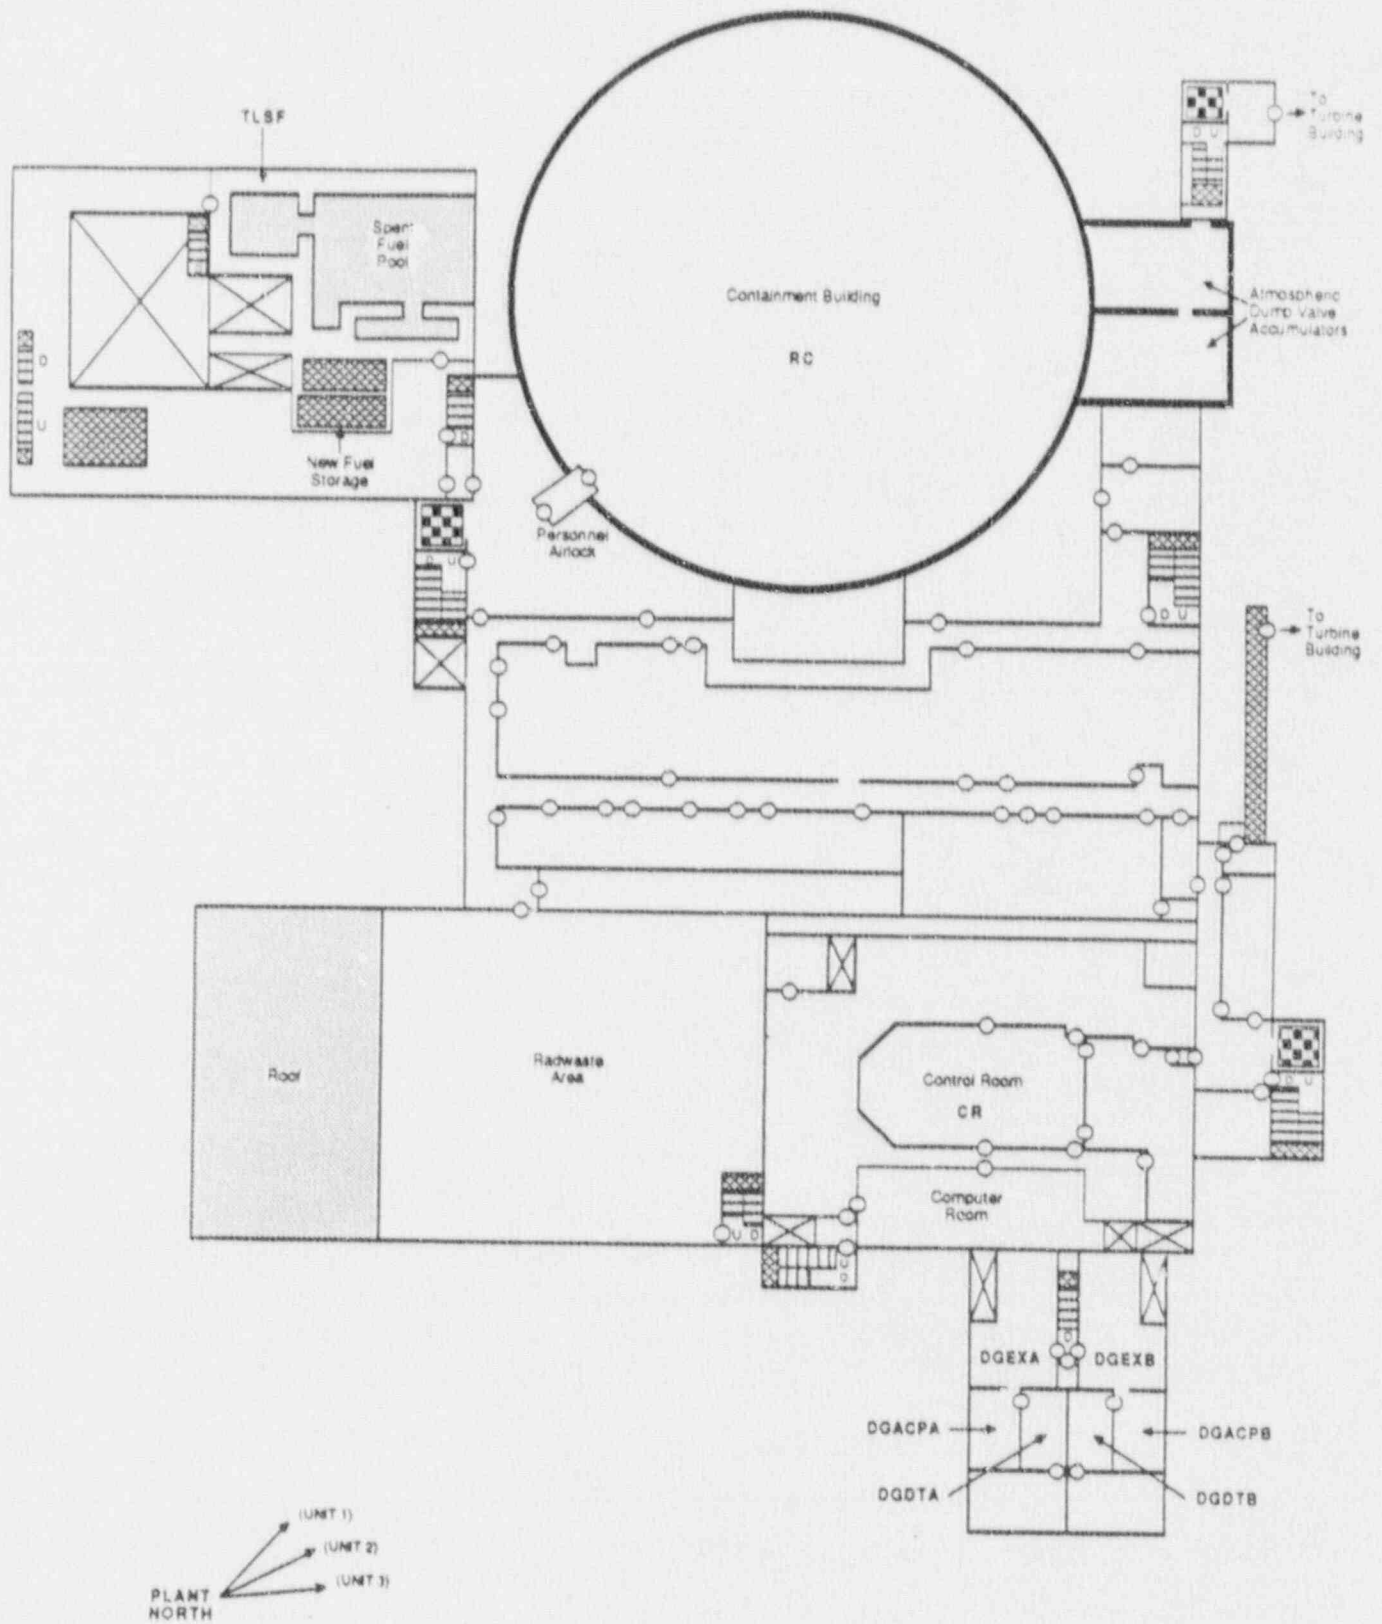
Palo Verde Power Block (Except Turbine Building), 140 ft. Elevation
